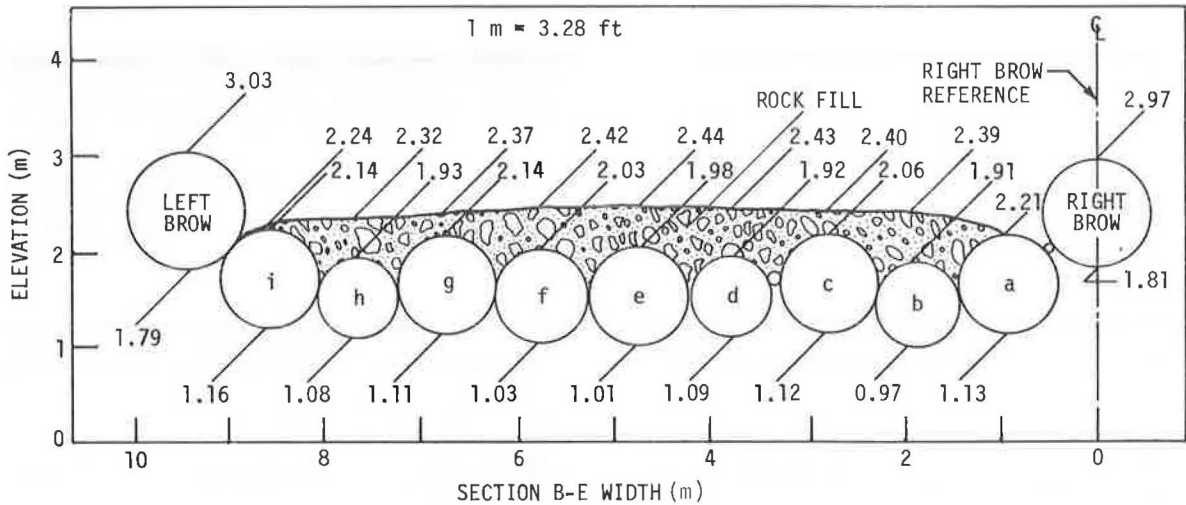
Cross-section of 22 m (72 ft) West Fork Stoney Creek Bridge at midspan.
